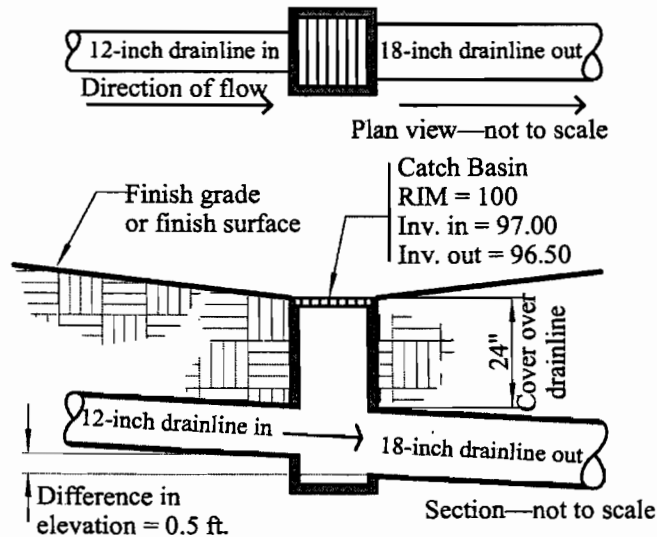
Condition 2—Setting Invert Elevation for Larger Size Pipe Out
